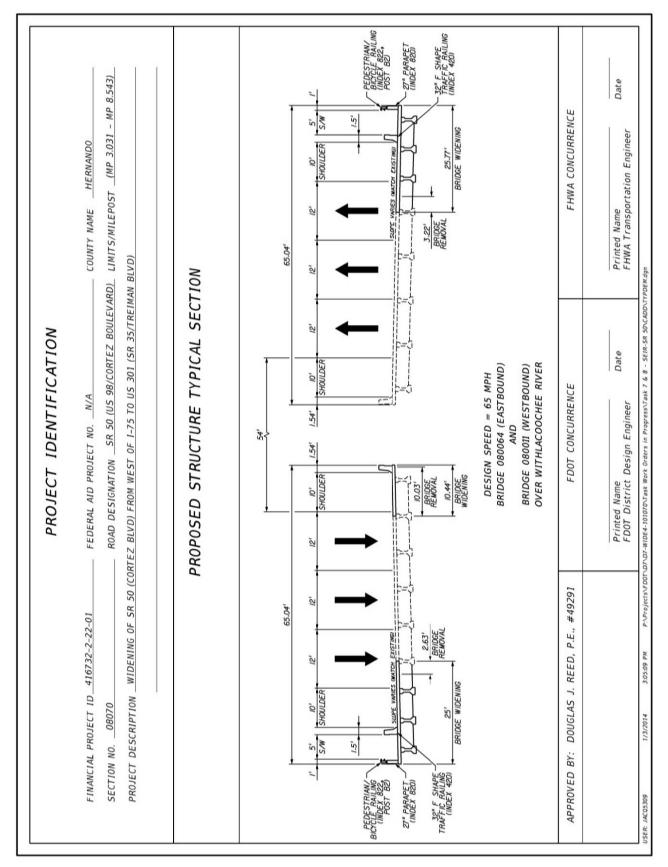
Proposed Roadway Typical Section Bridge 080011 (westbound) and Bridge 080064 (eastbound) over Withlacoochee River
